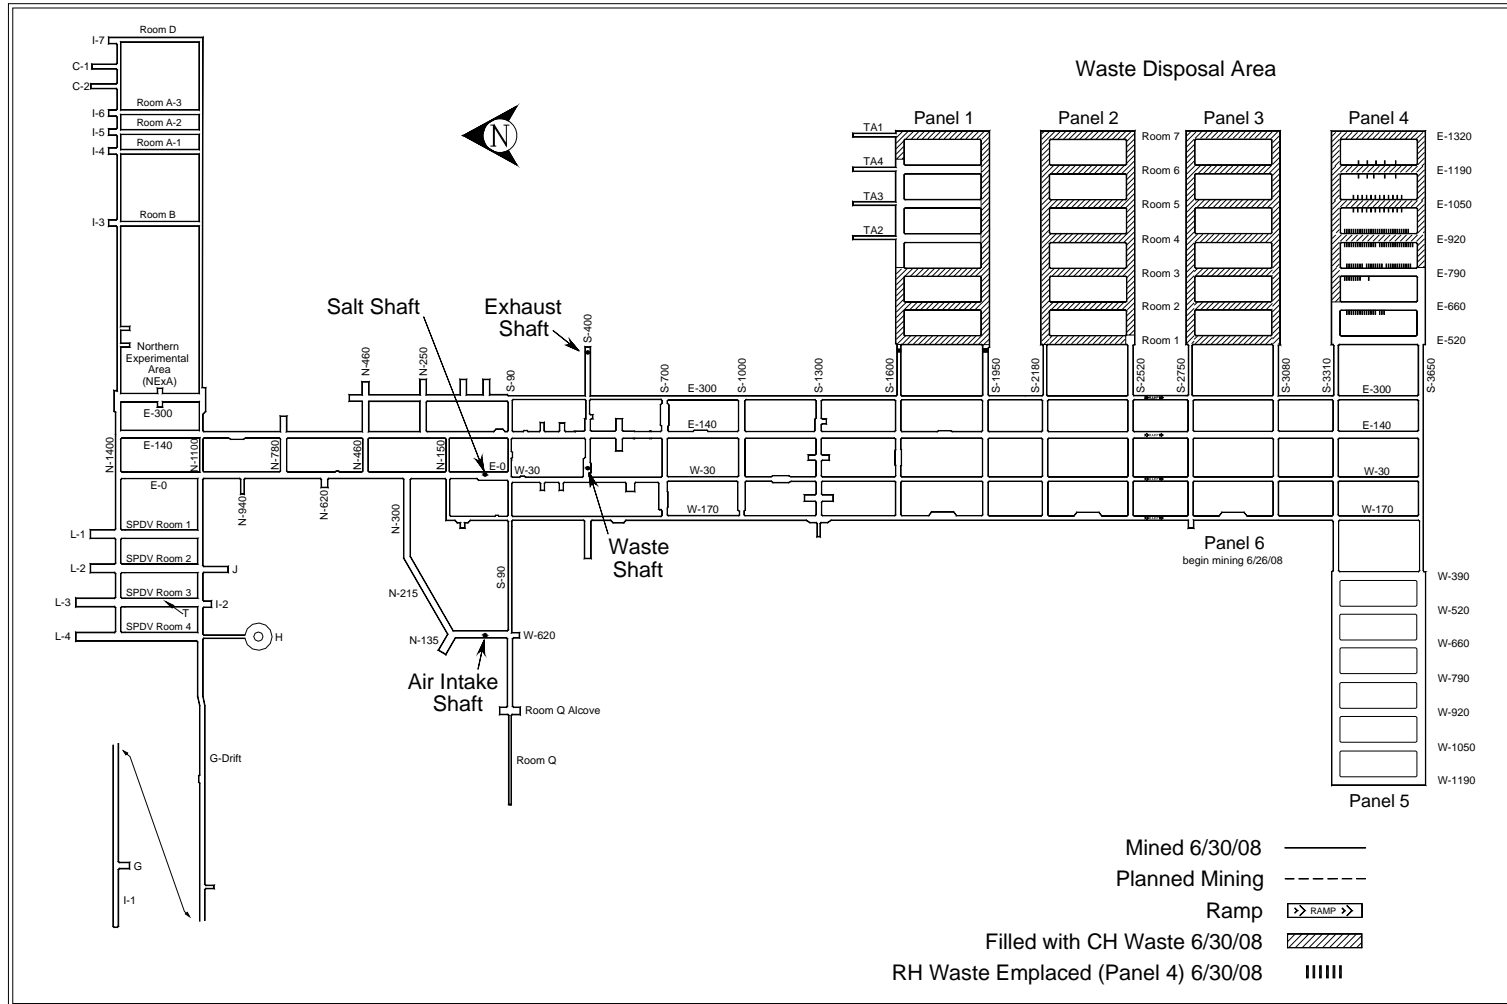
Underground Mining and Waste Disposal Configuration as of June 30, 2008
